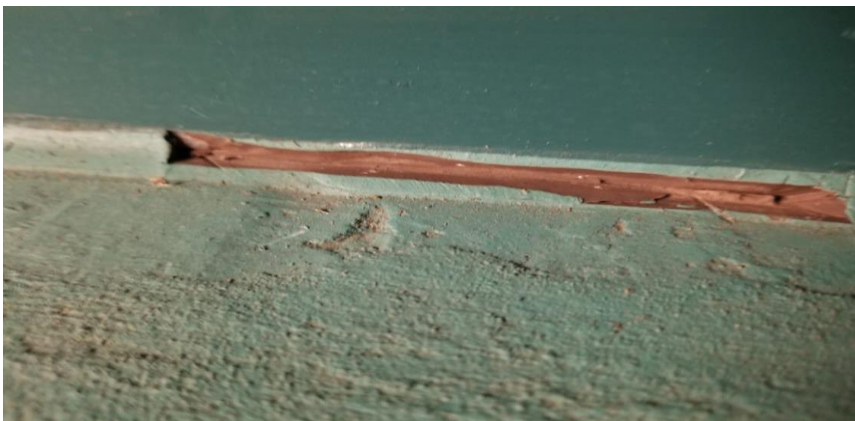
View of asbestos-containing wall caulking (Brown) observed to be in good condition in Room 014.
